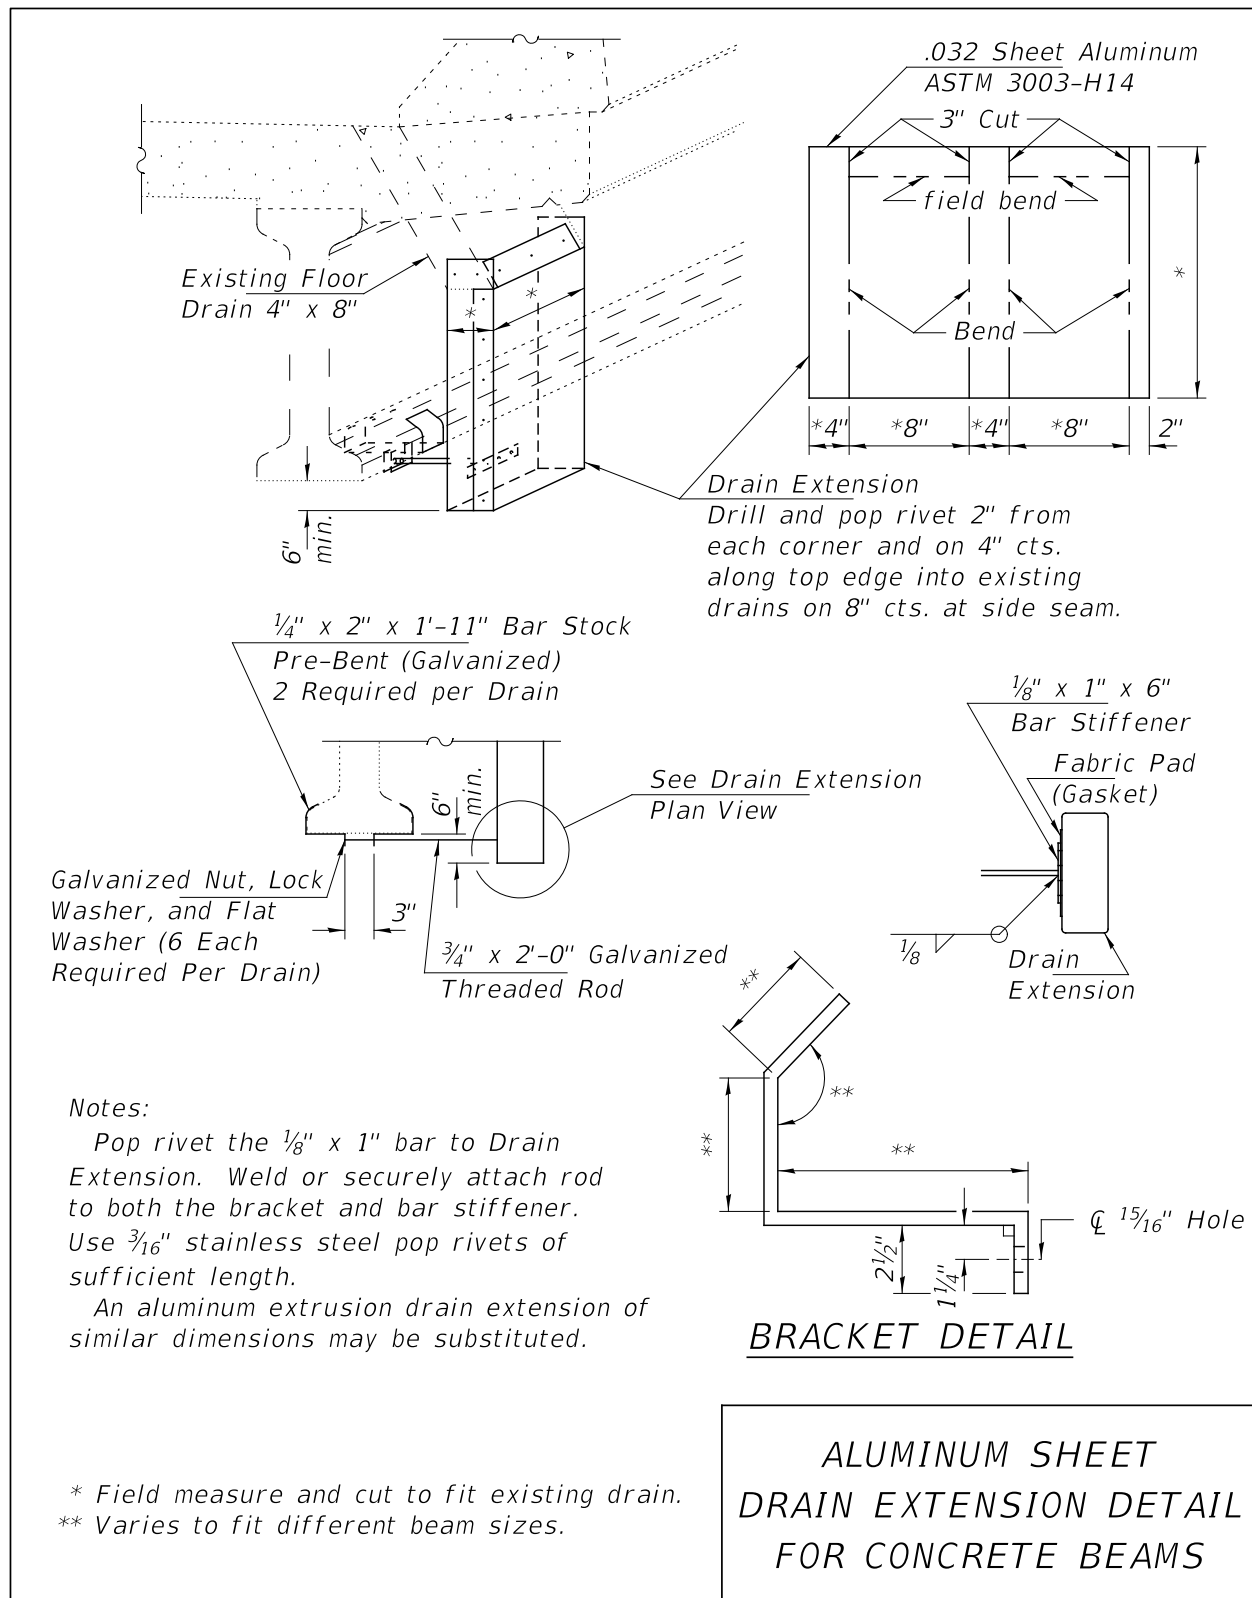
Aluminum Sheet Drain Extension Detail for Concrete Beams
